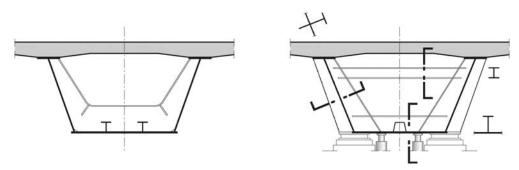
Examples of frame cross bracing for a U shaped steel section.
